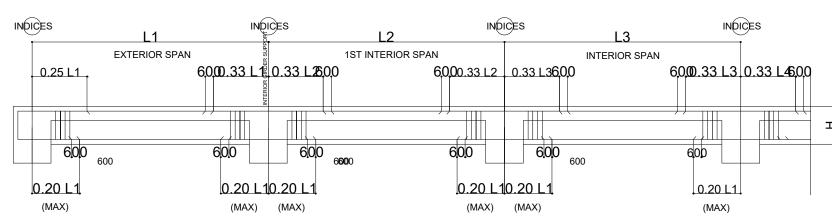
TYPICAL BAR DETAILS FOR BEAMS
